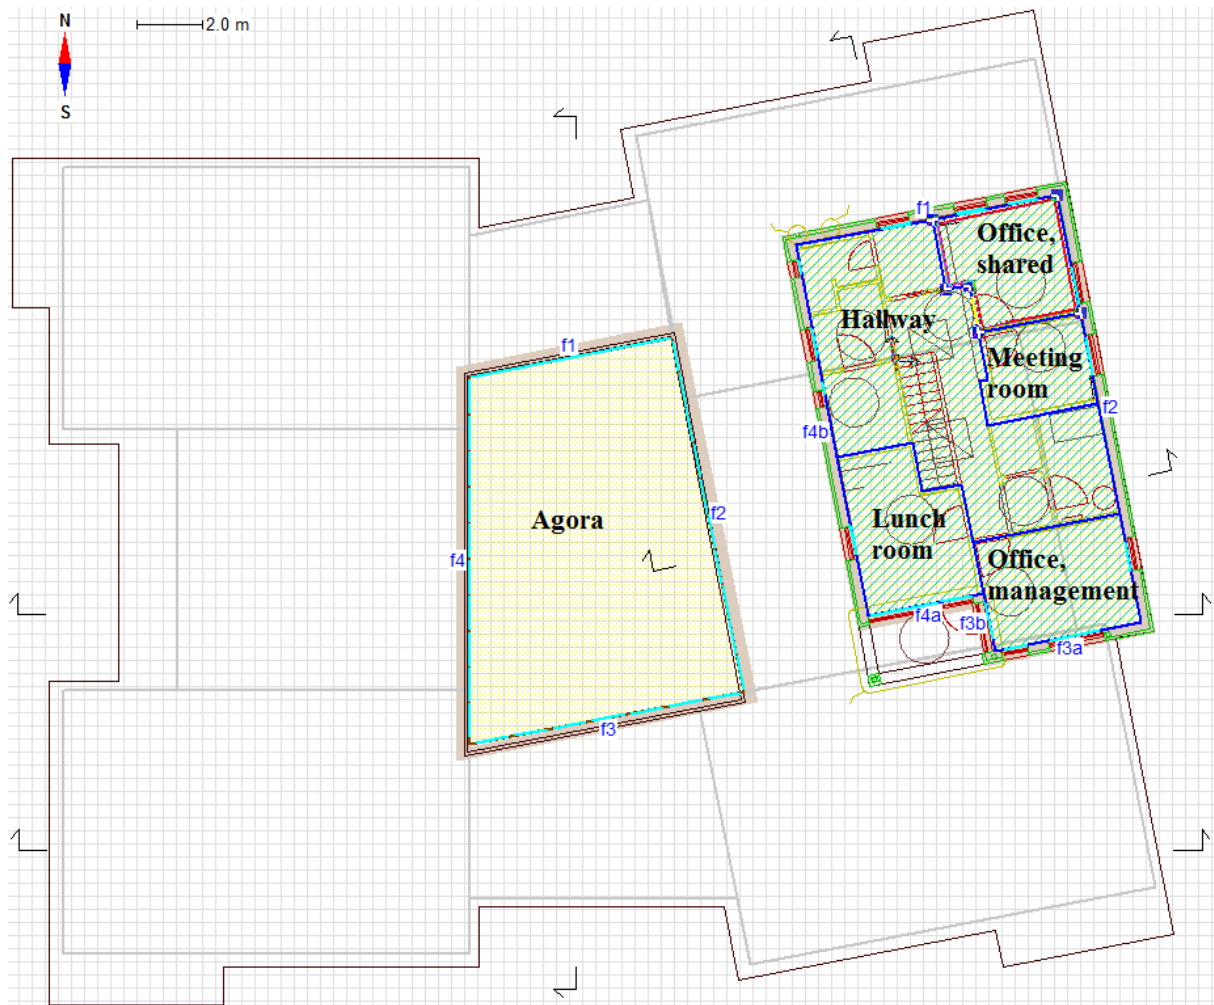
Plan drawing with zone division for the 2nd floor at Solstad kindergarten.
